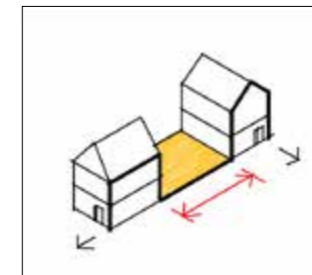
Side gable elevations opposing rear elevations require a minimum back-to-side distance of 11 metres
